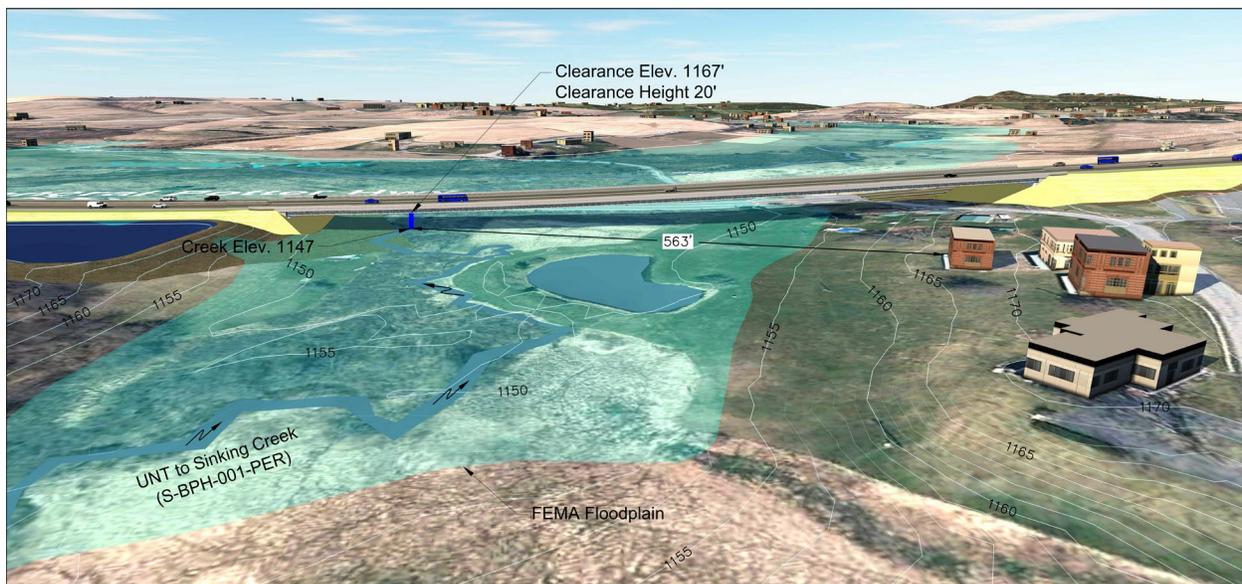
Proposed Crossing at Station 502 - 513 for UNT to Sinking Creek near Mountain Back Road (looking downstream)
